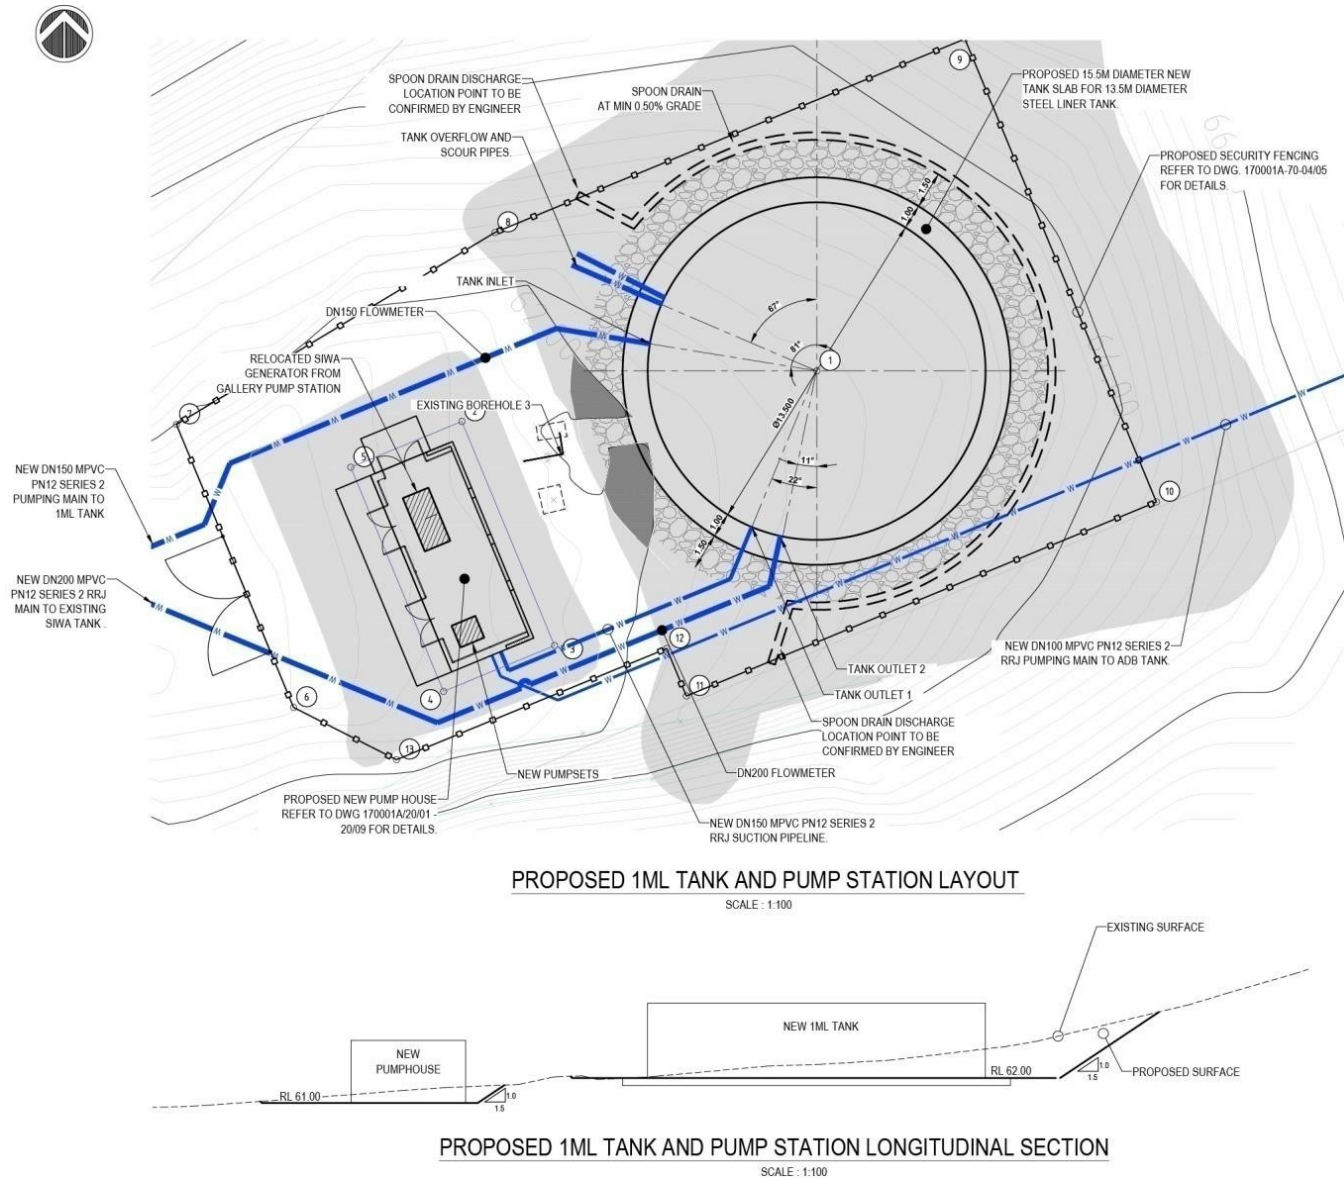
New 1ML tanks and Pump Station layout and Longitudinal Section
